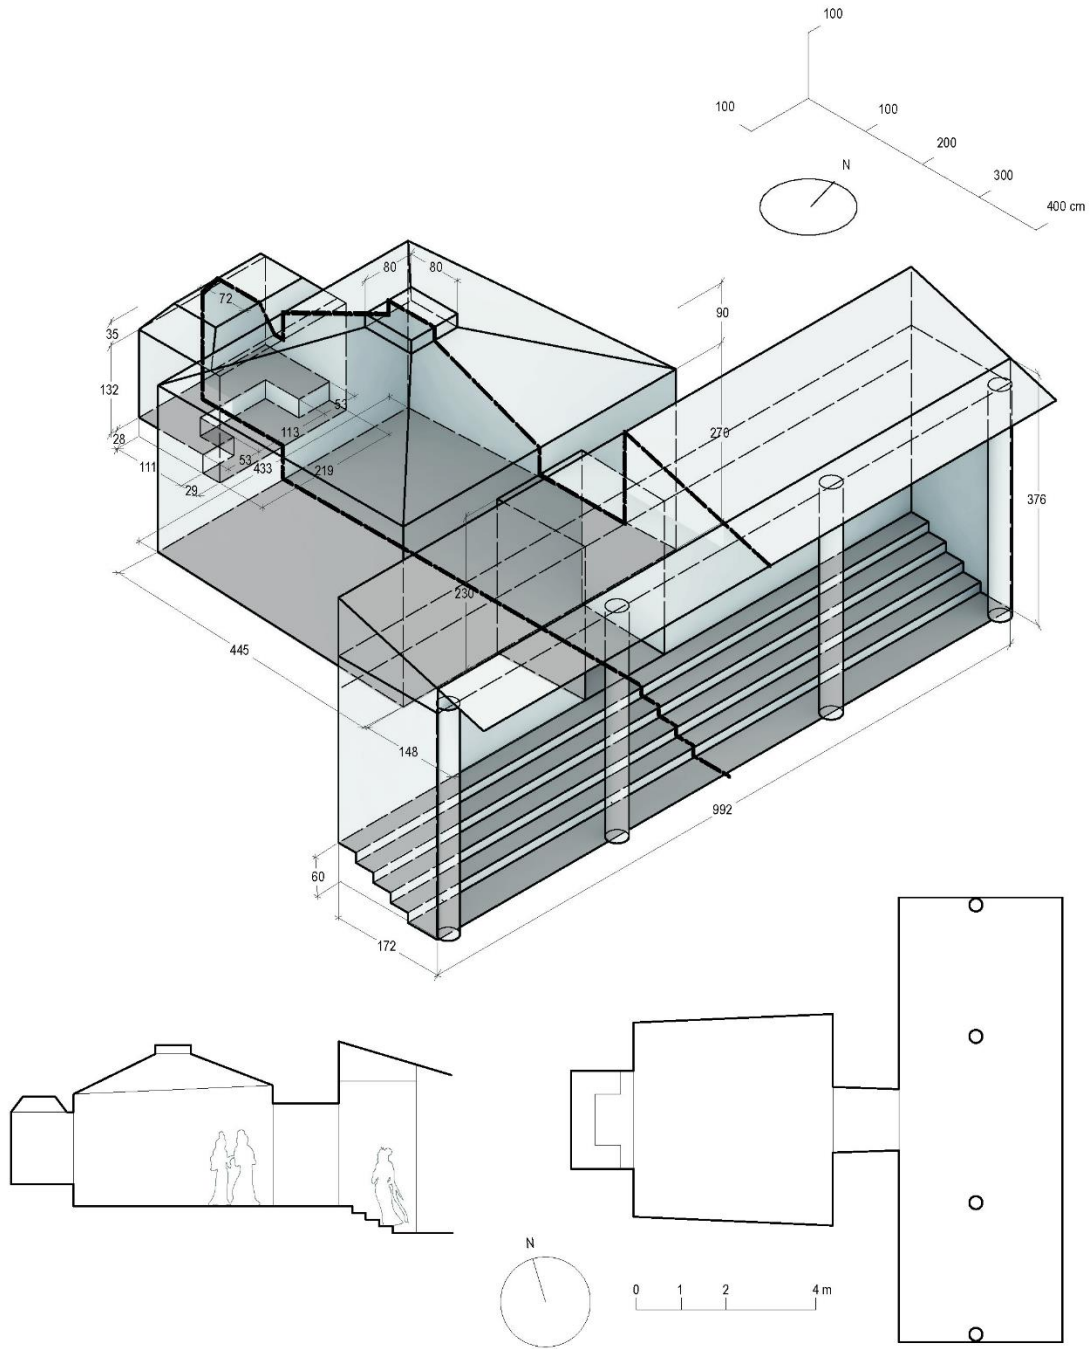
Isometric view, plan, and sectional drawings of Mogao Cave 366. Drawing by author.
